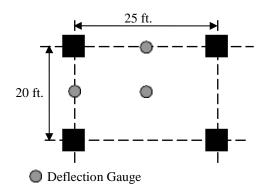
Typical Arrangement of Deflection Gauges on Slab Panels
